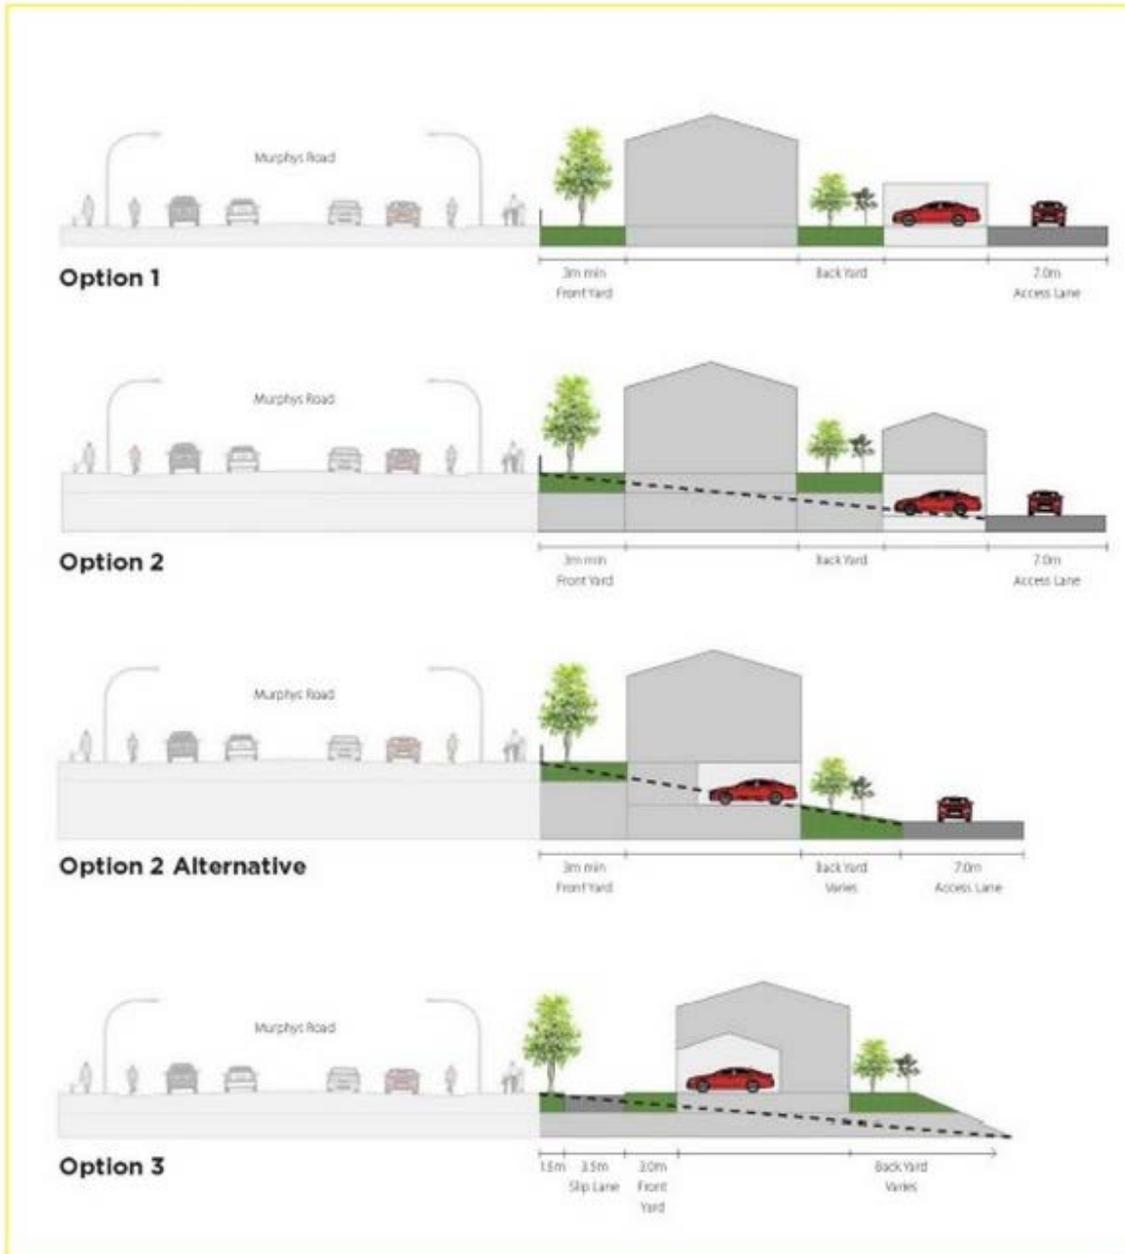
Possible design options for subdivision layouts within the National Grid Subdivision Corridor
